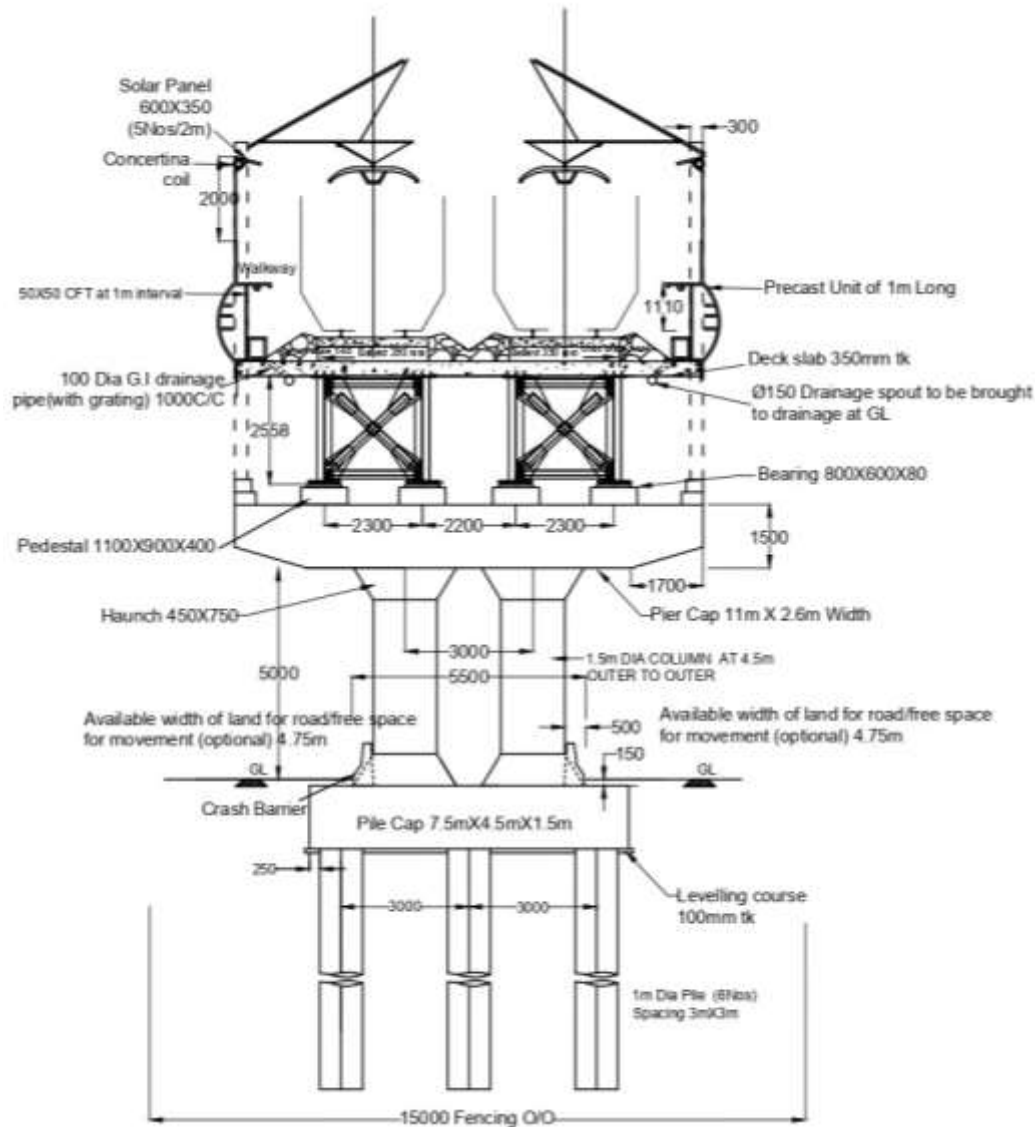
General Arrangement of RoR with Steel - RCC Composite Girder
